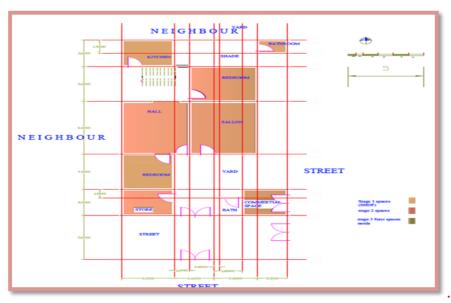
Mohammed Hassan house Ground floor plan (Source: Author)
